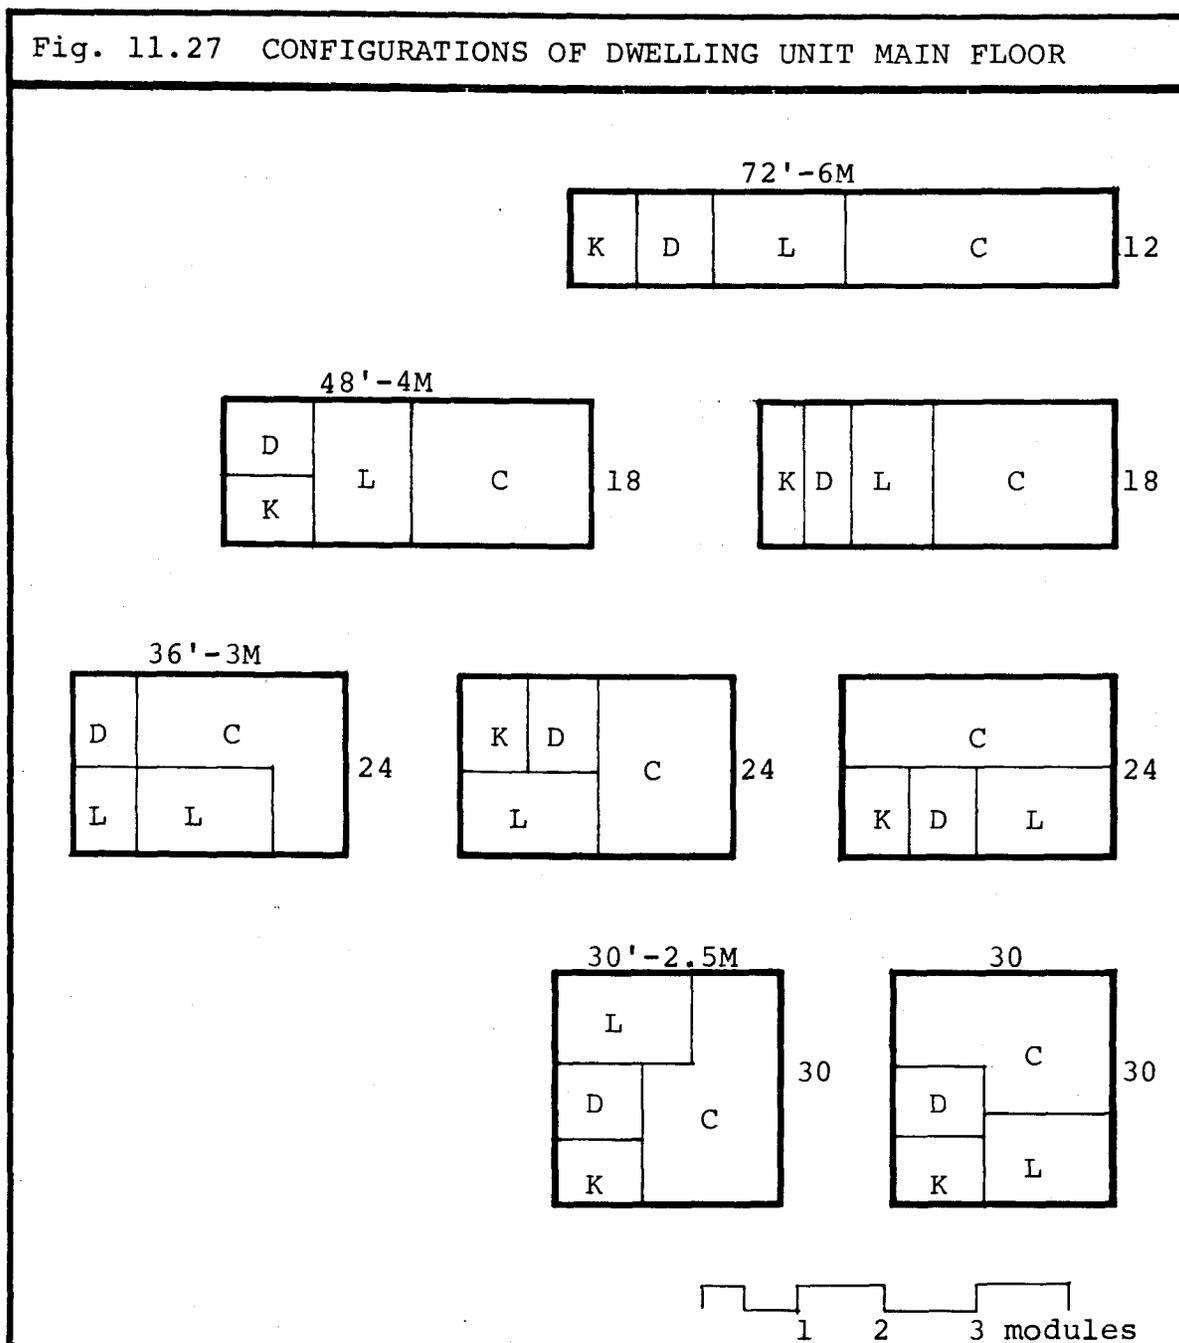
CONFIGURATIONS OF DWELLING UNIT MAIN FLOOR
